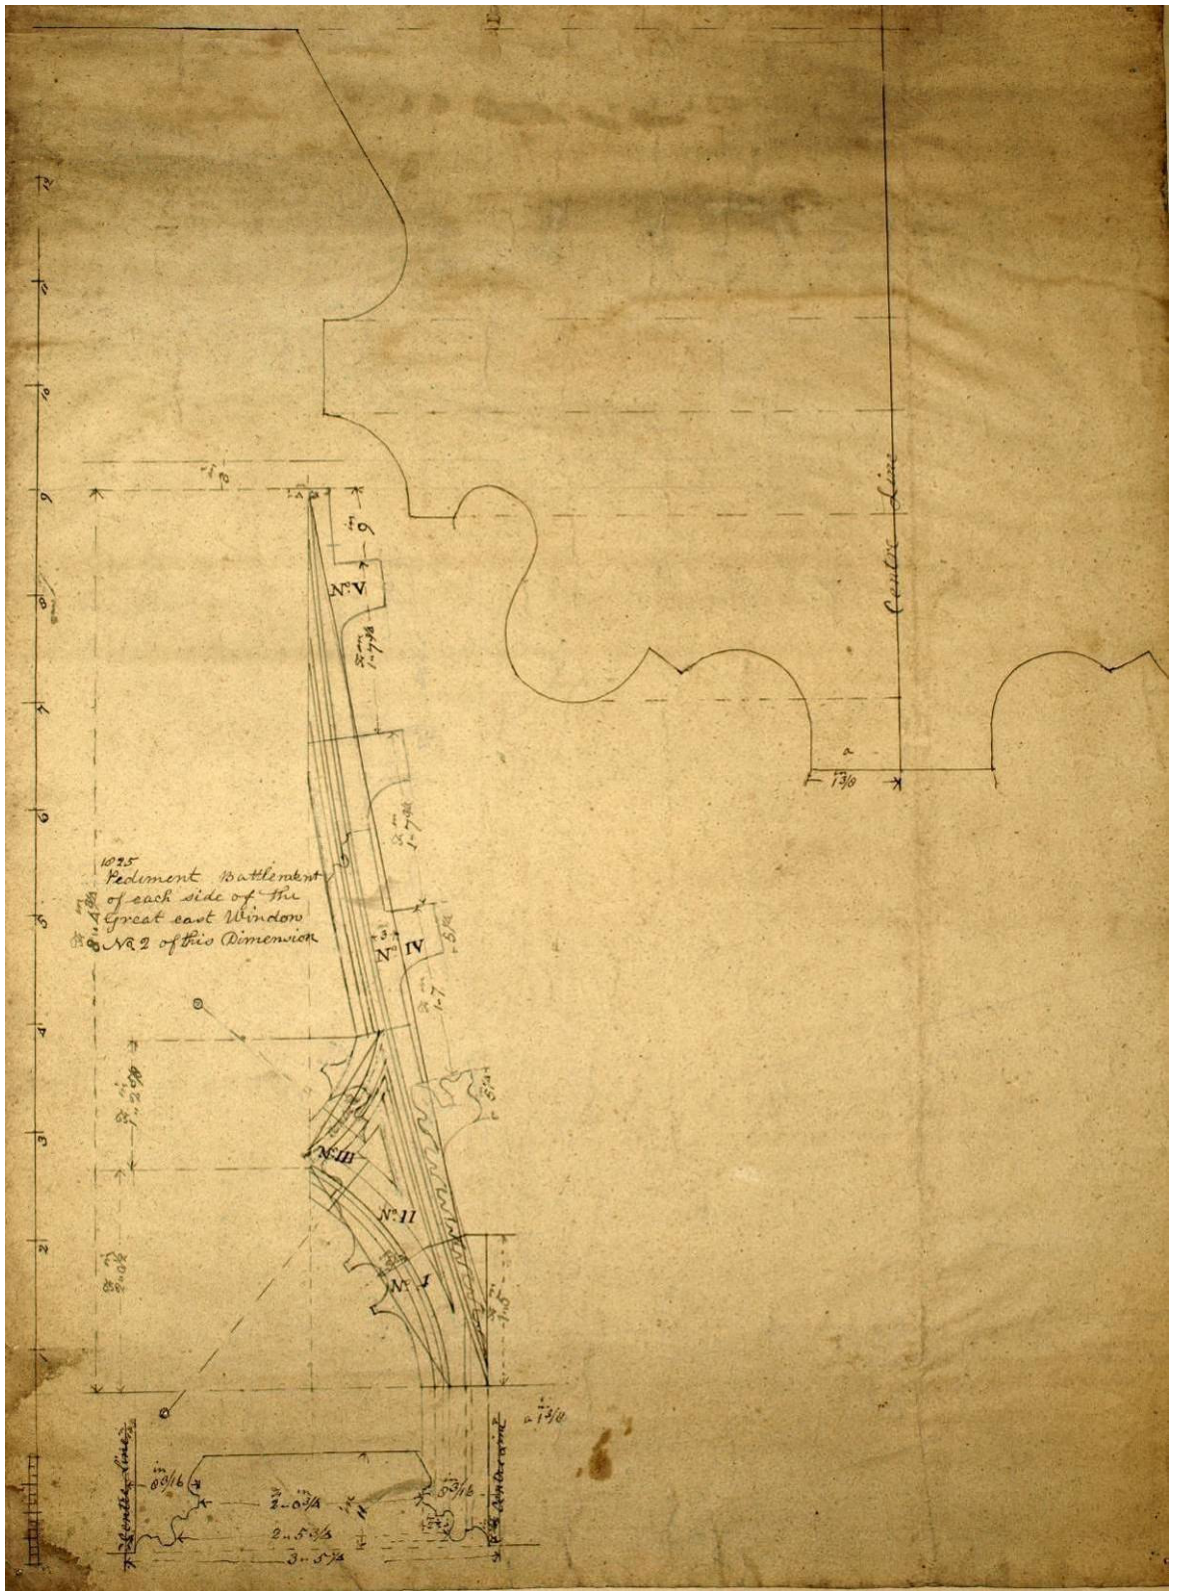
Setting-out elevation of parapet gablet, William Shout 1825 (YML/3/43)
